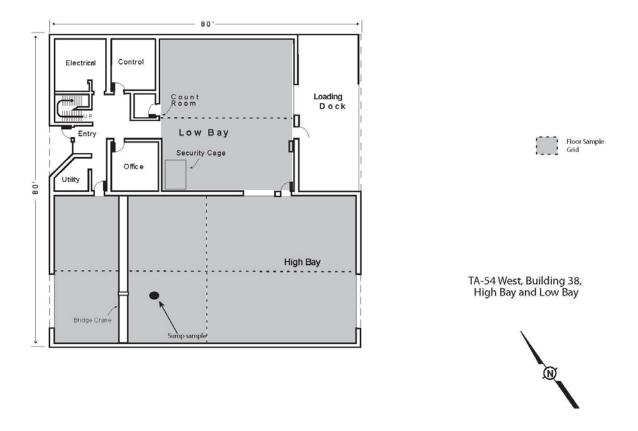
Technical Area 54, Building 38 (High, Low Bay, and Loading Dock Sampling Locations)
